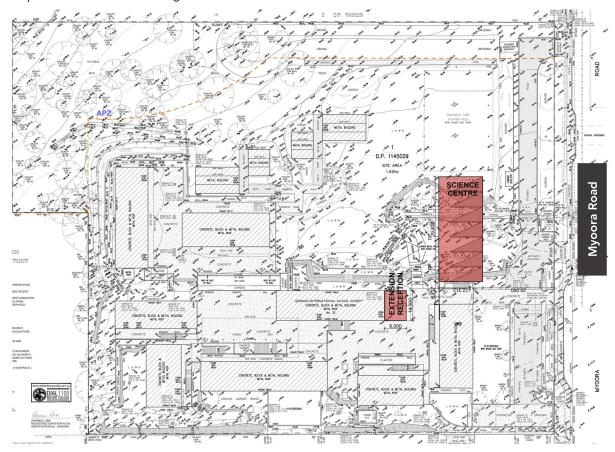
Proposed Site Plan (Source: Betti and Knut)
